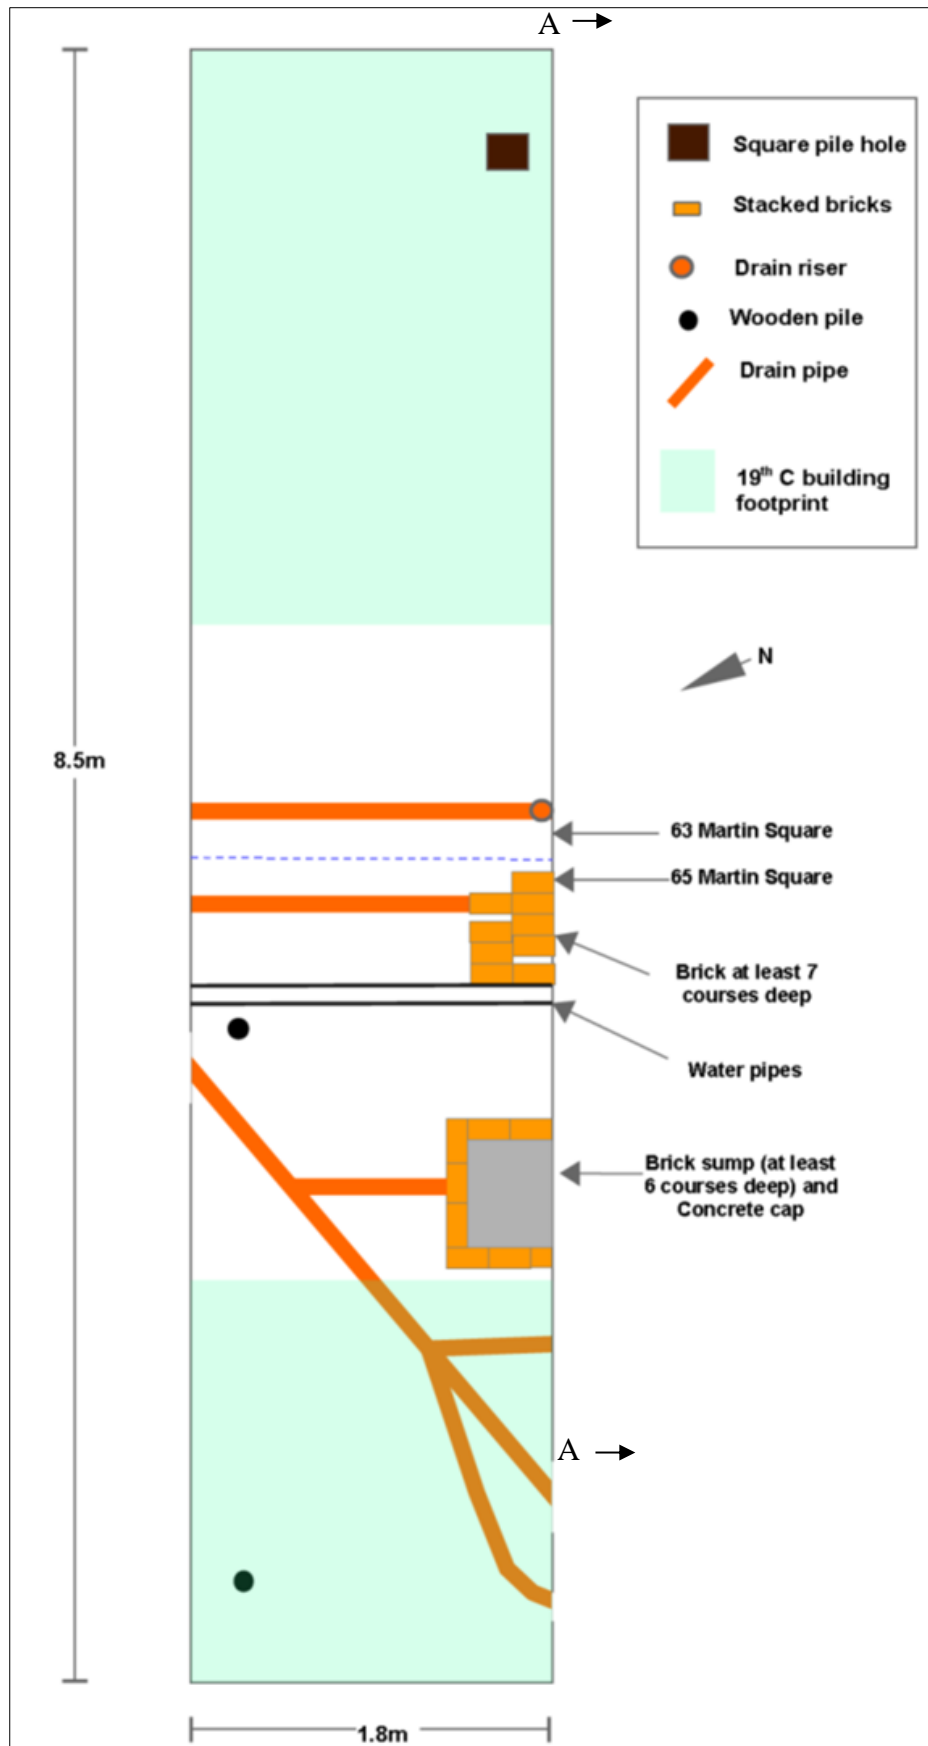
Area 3 trenching for retaining wall - plan view (8.5m of the trench drawn only as shown in Figure 6.83; 63-65 Martin Square boundary indicated)
